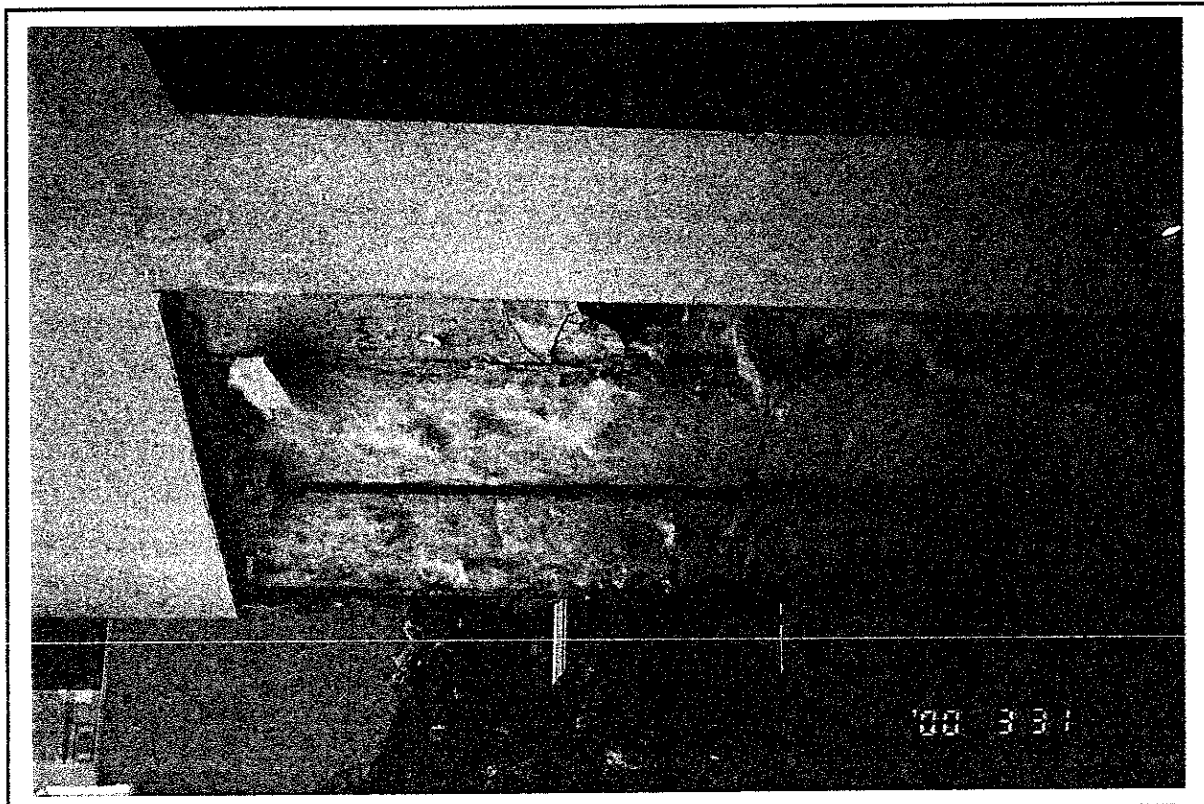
Test Area #9 – Extensive corrosion at steel studs
